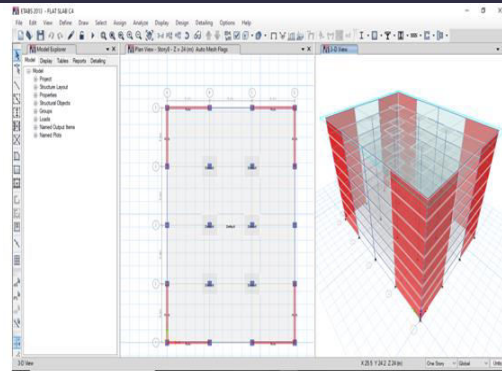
Plan and 3D view of flat slab structure with shear wall and drop
